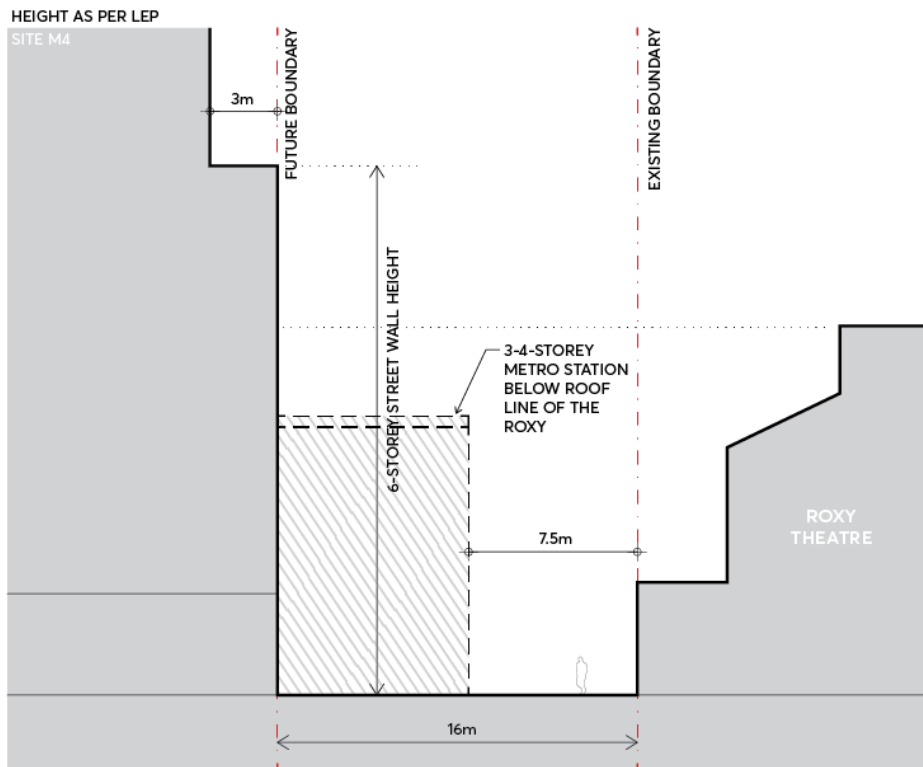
Macquarie Lane (Section E) Setbacks & Street Wall Height
